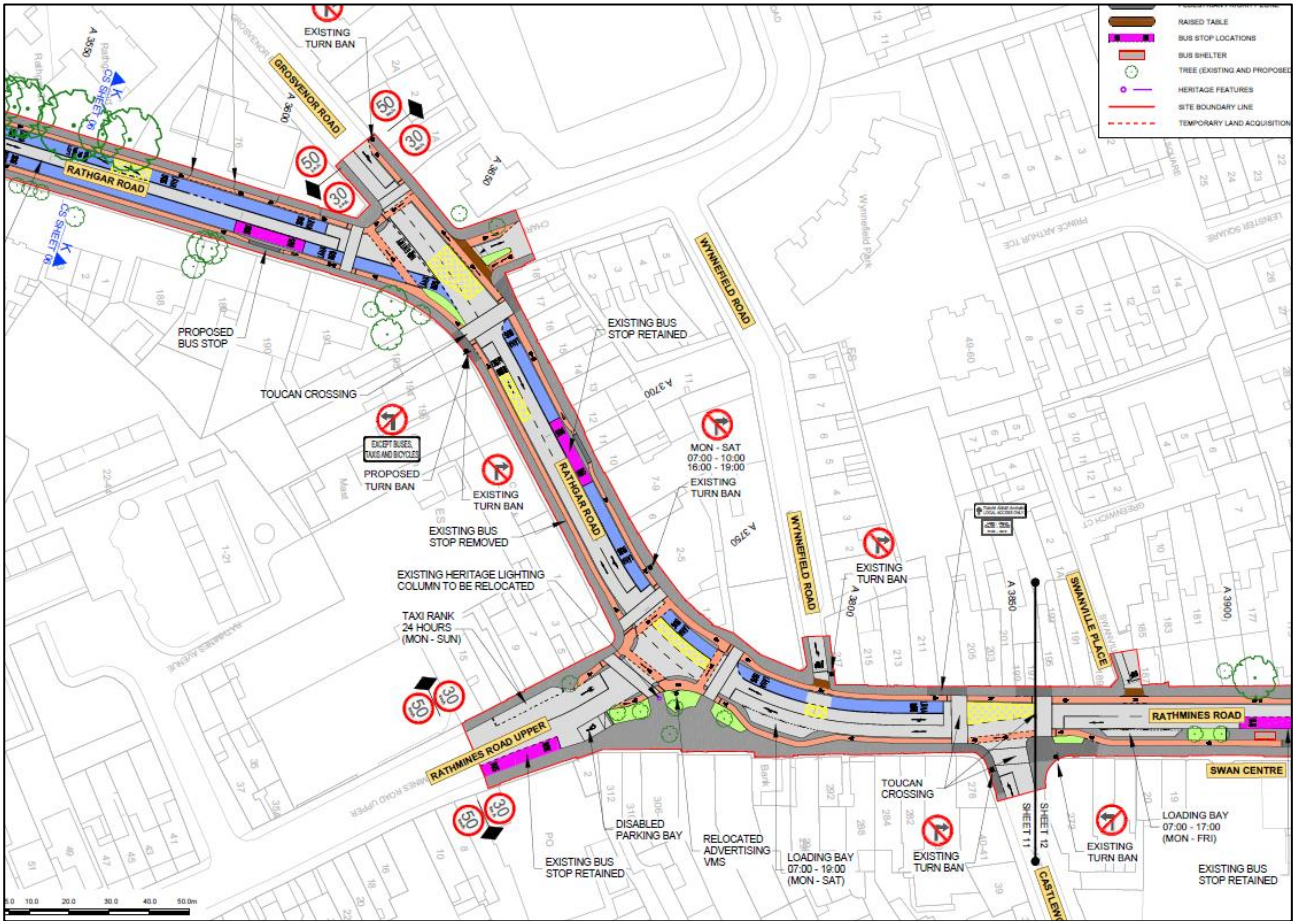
Extract from General Arrangement Drawings (Sheet 11)
